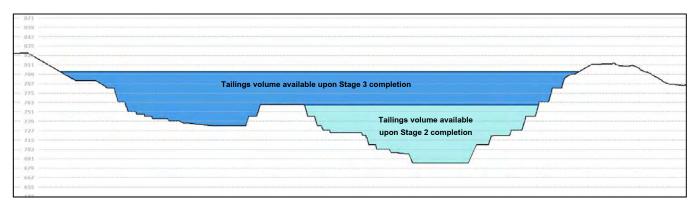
Section Through Area 2 Pit Showing Tailings Volume Made Available with Staged Mining of Area 2.
